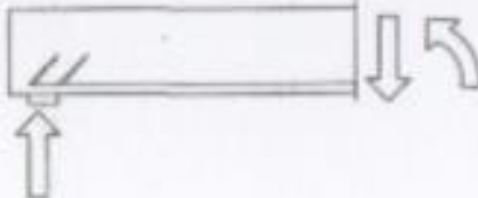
Examples of Intrinsic cracks in hypothetical concrete structure
